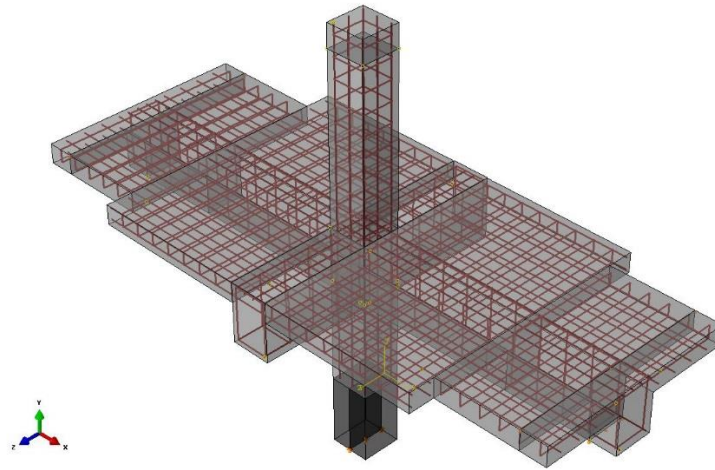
FE model of the full-scale beam-column joint specimen.
